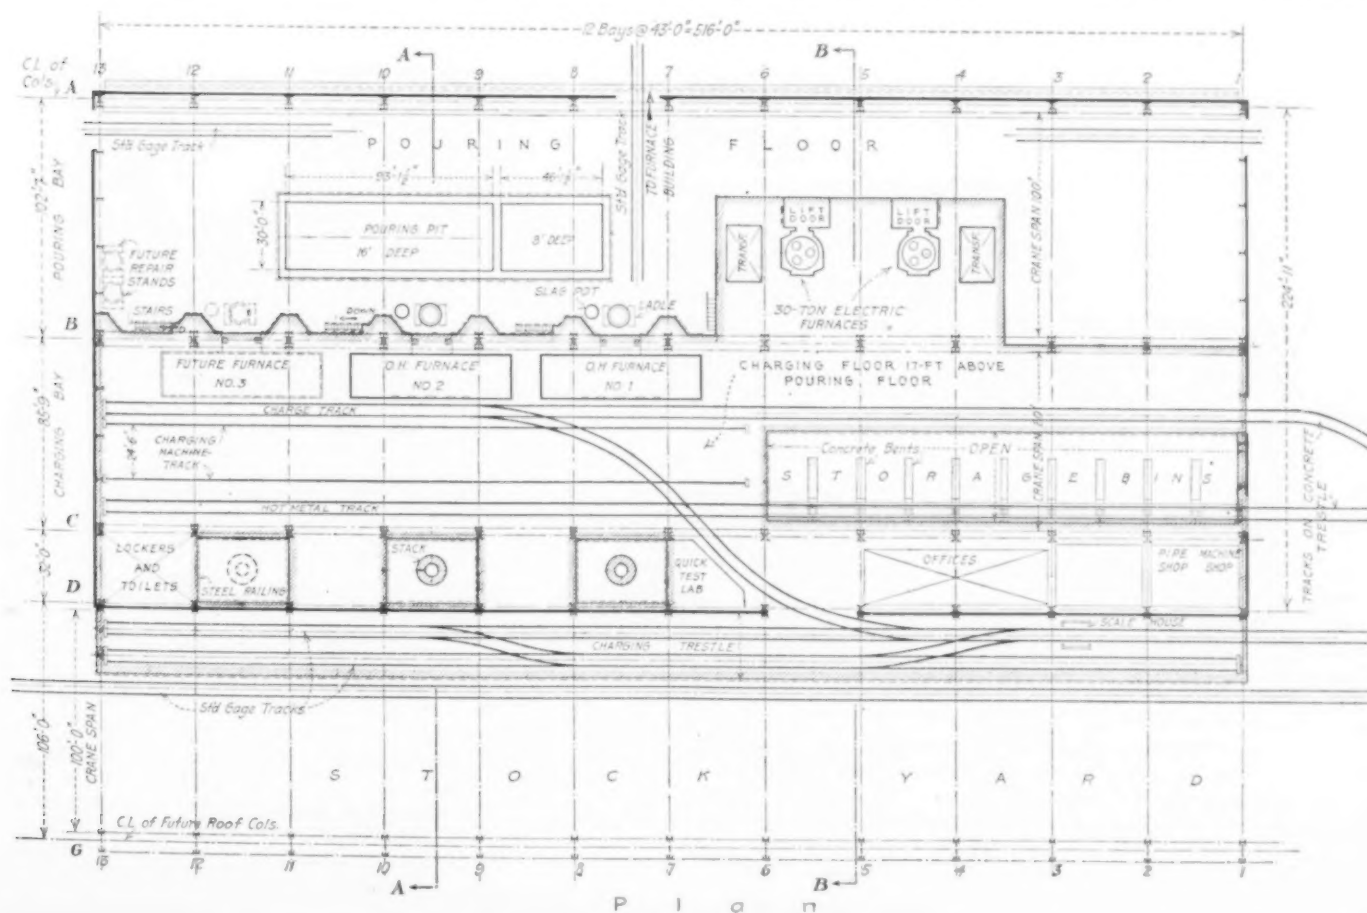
FLOOR PLAN OF OPEN-HEARTH BUILDING
